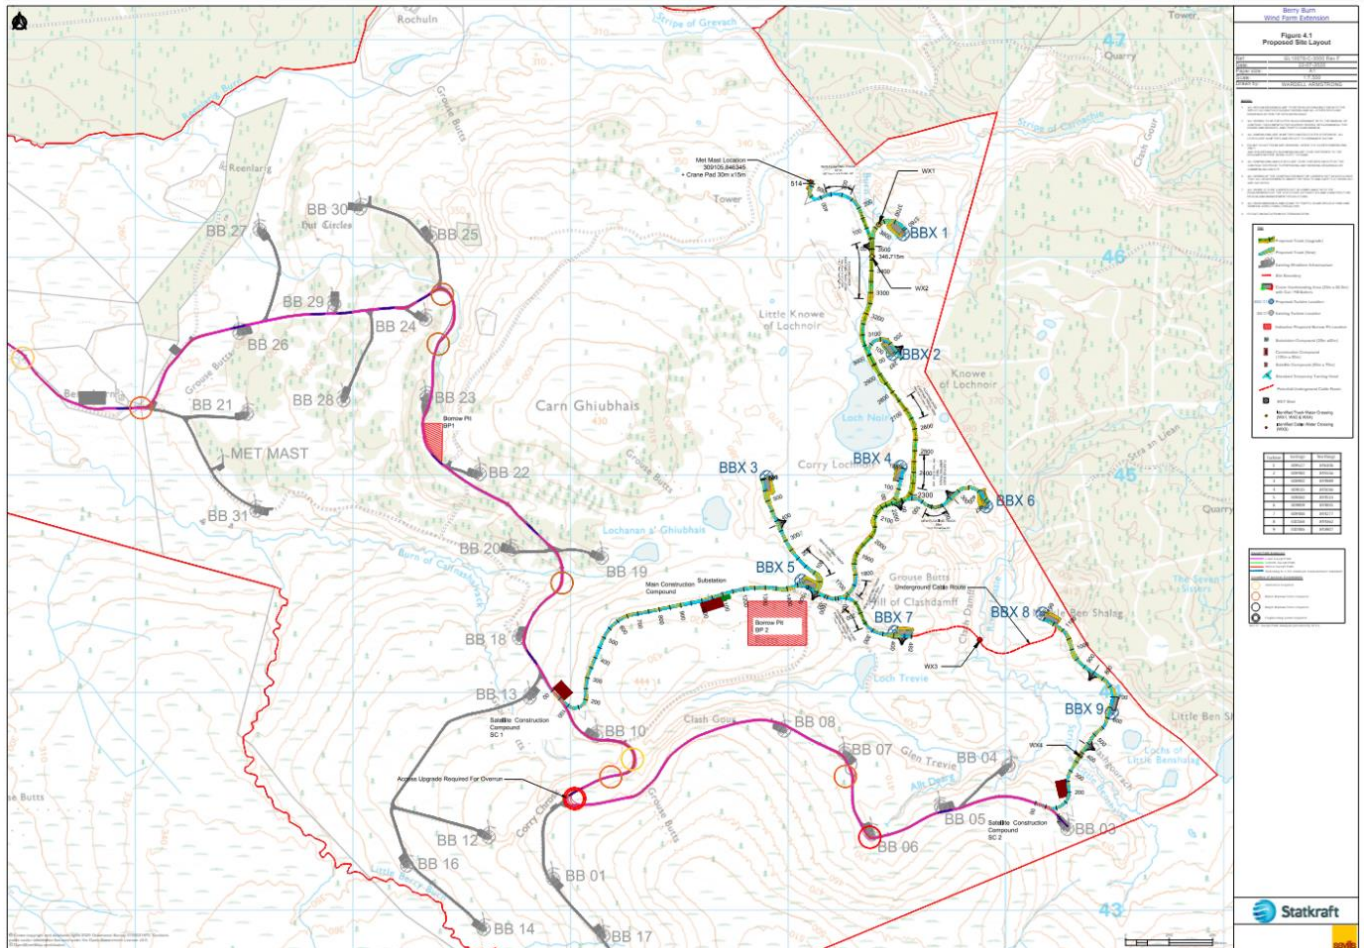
Approved Berry Burn Wind Farm Extension Site Layout Plan
